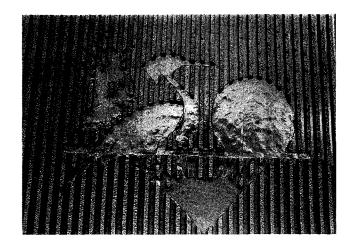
Seascape graphics cast into surface of precast concrete noise barrier with fractured fin finish on I-95 in Florida.
